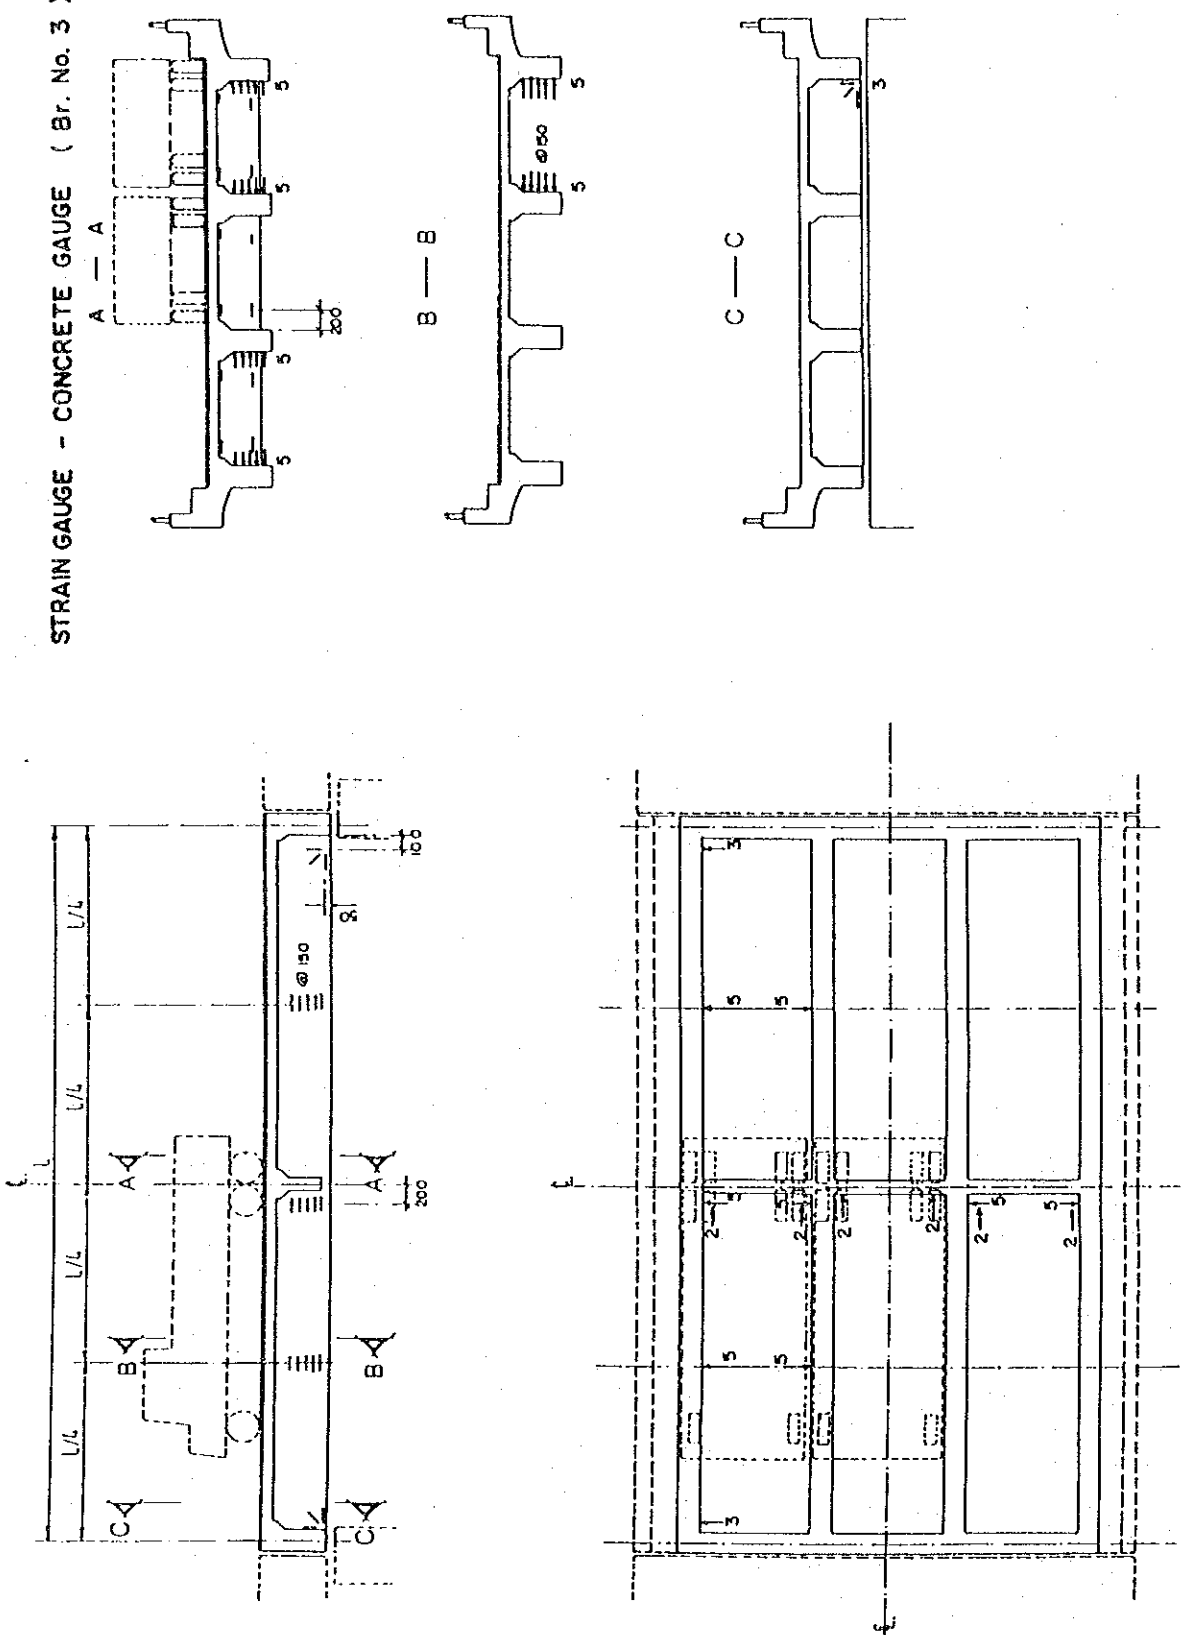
Setting Position of Measurement Equipment (Br.No.3)
